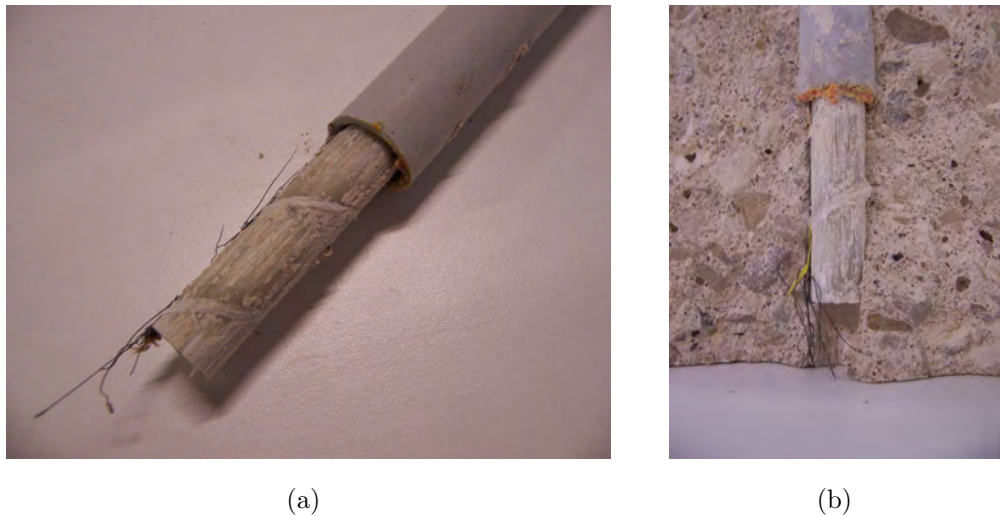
Pull-out failure mode of (a) B-G/R4-C1 specimen with little damage on the rebar surface and some attached concrete and (b) B-G/R4-C2 specimen with damage concentrated on rebar surface.
